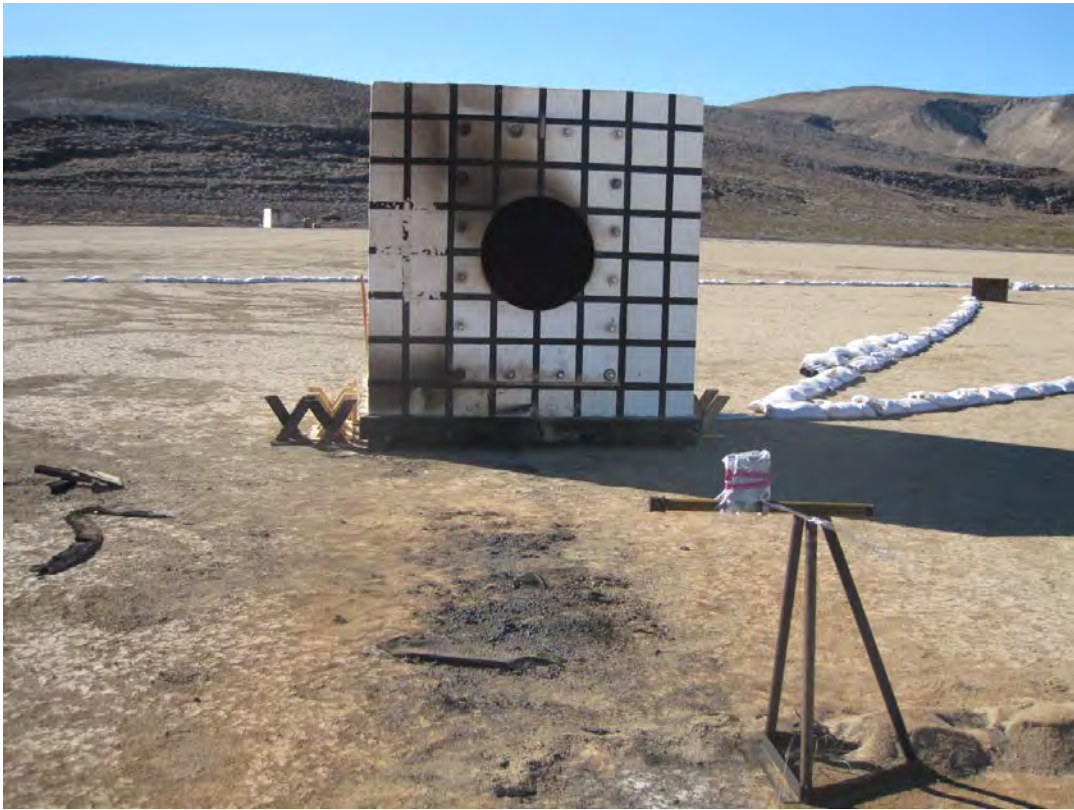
Structure After Test 1 Showing Evidence of Plume on Ground.
